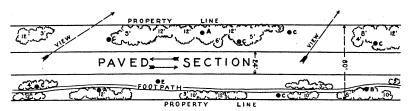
An 80-foot right-of-way with a 24-foot improved road planted informally, leaving 28 feet of planting space on each side. The footpath winds along one side of the road. The shrubbery clumps should be composed of plants from 3 to 12 feet high.
